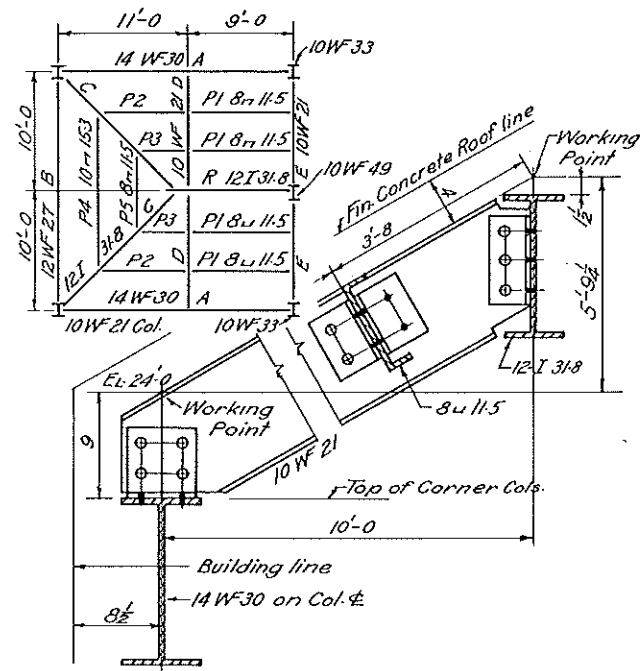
Roof framing plan and sketch of sloping rafter D.
